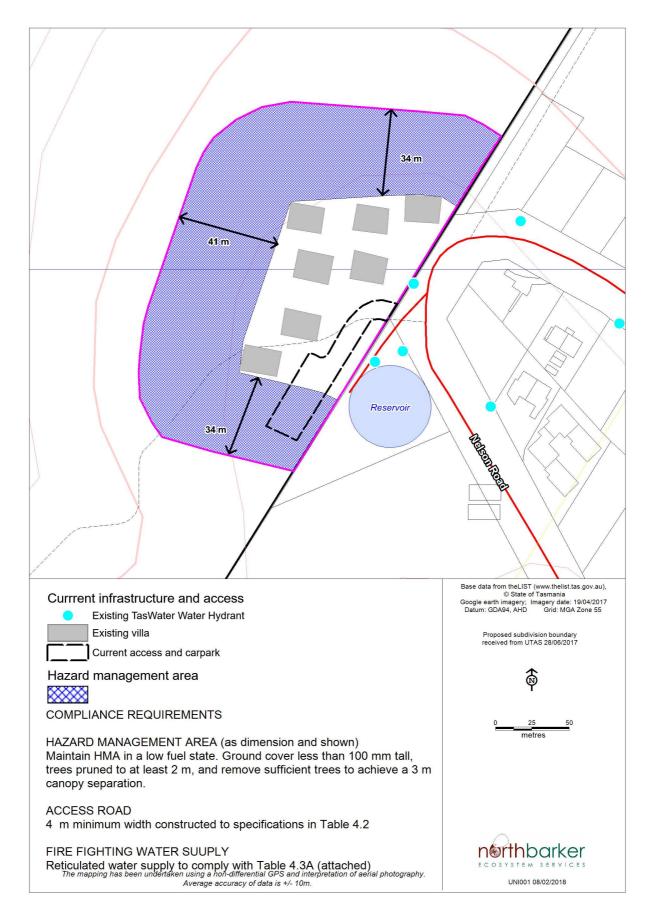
BUSHFIRE HAZARD MANAGAMENT PLAN.
